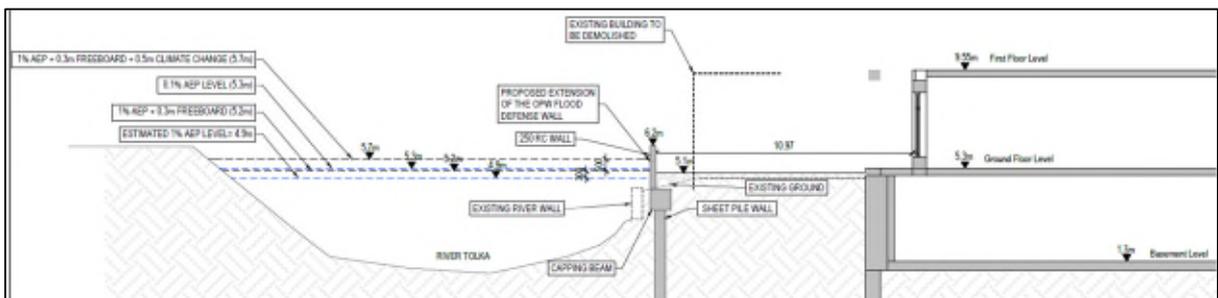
Section of Tolka River and New Flood Wall (extract from Drawing 210027-DBFL-XX-SP-DR-C-5006)
